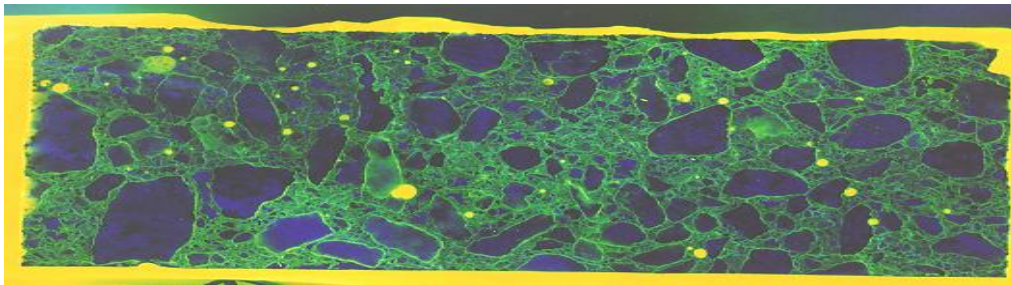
Crack pattern in specimen #2 after 112 cycles. Specimen width: 120 mm.
